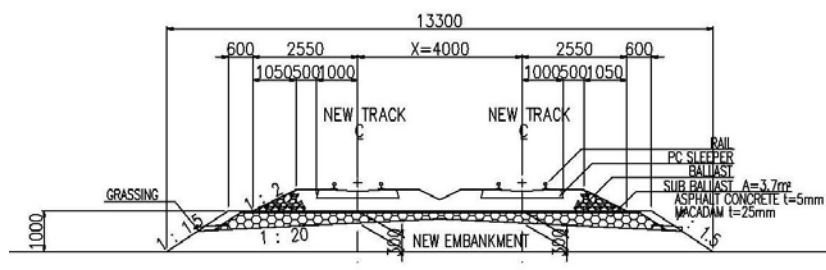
Construction Method for New Piled Embankment on the Pyk - Kpt Section
